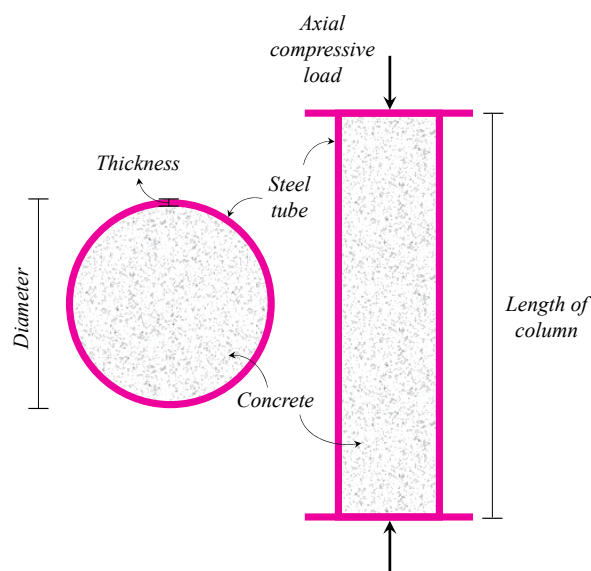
Specimen details and loading configuration of circular long CFST columns.
